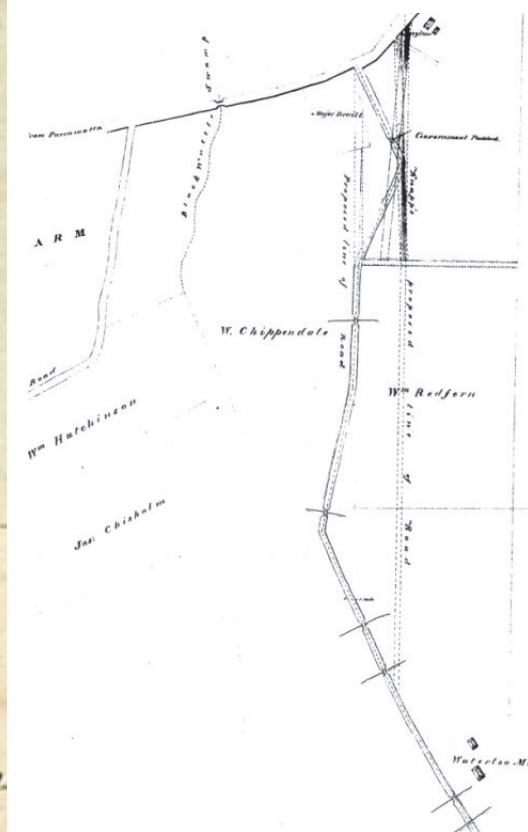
The alignment of Regent Street/Botany Road is shown in this plan of January 1842 prepared by Captain Wilson. The survey was undertaken to dedicate the road a parish road. Wilson recorded an existing alignment that was continued with, and another alignment following the future Botany (Cope) Street south to the Waterloo Mill recommended by Edward Knapp.
